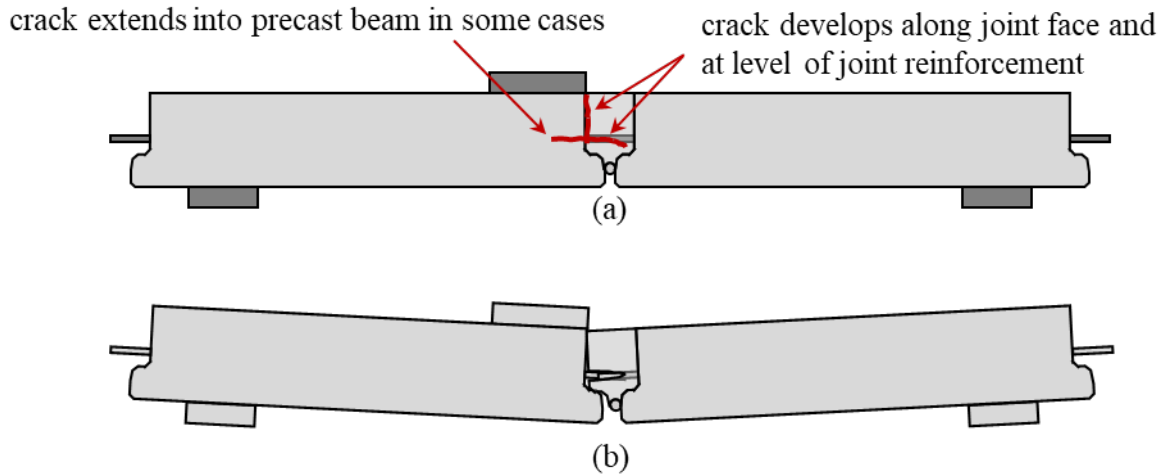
Typical failure in 12-inch-deep specimens with cracking along joint face and at level of reinforcement: (a) cracking at failure and (b) after failure
